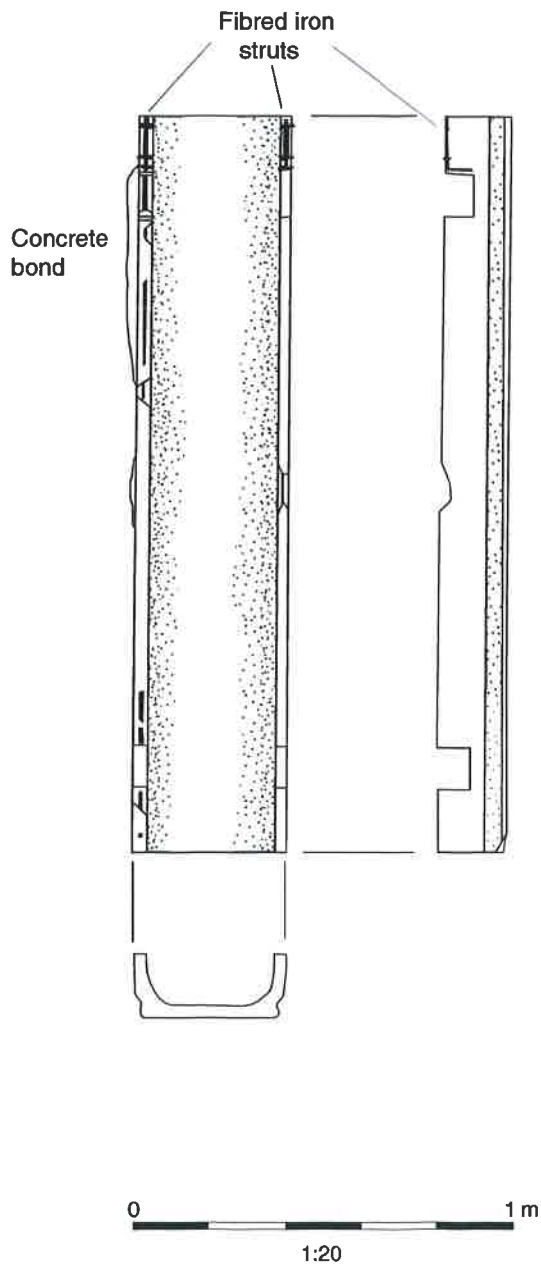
Third angle prjection of pre-fabricated concrete roof block
